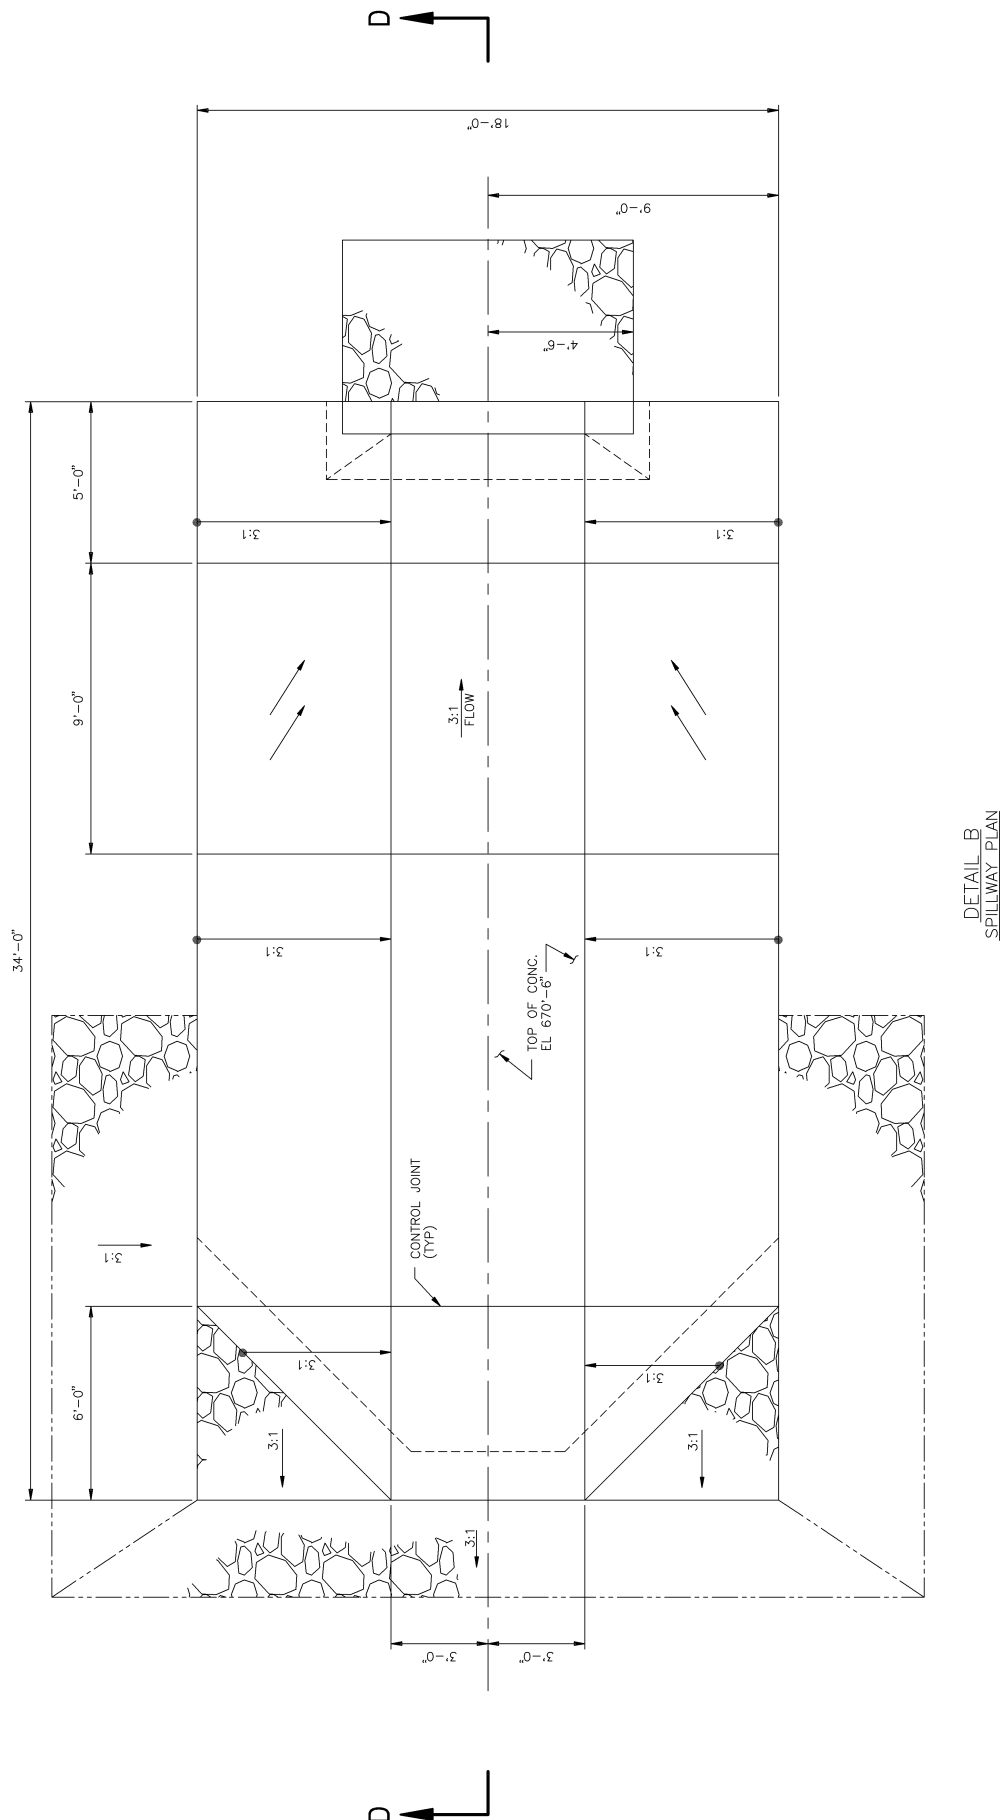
{Plant Arrangement - ESWEMS Retention Pond Spillway Plan}
